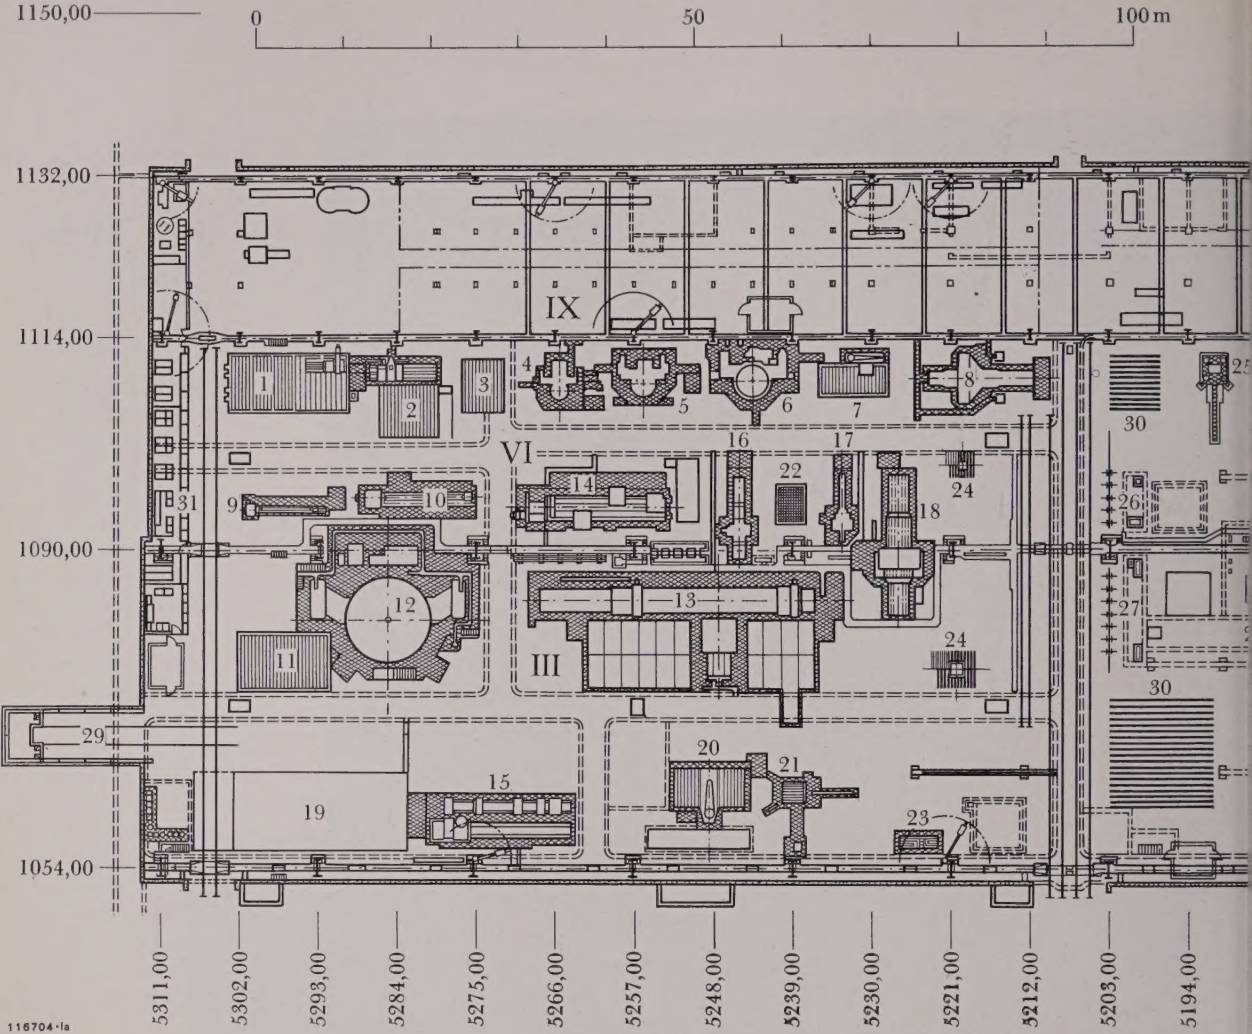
Plan showing the layout of the workshops in the first phase of Birr works
